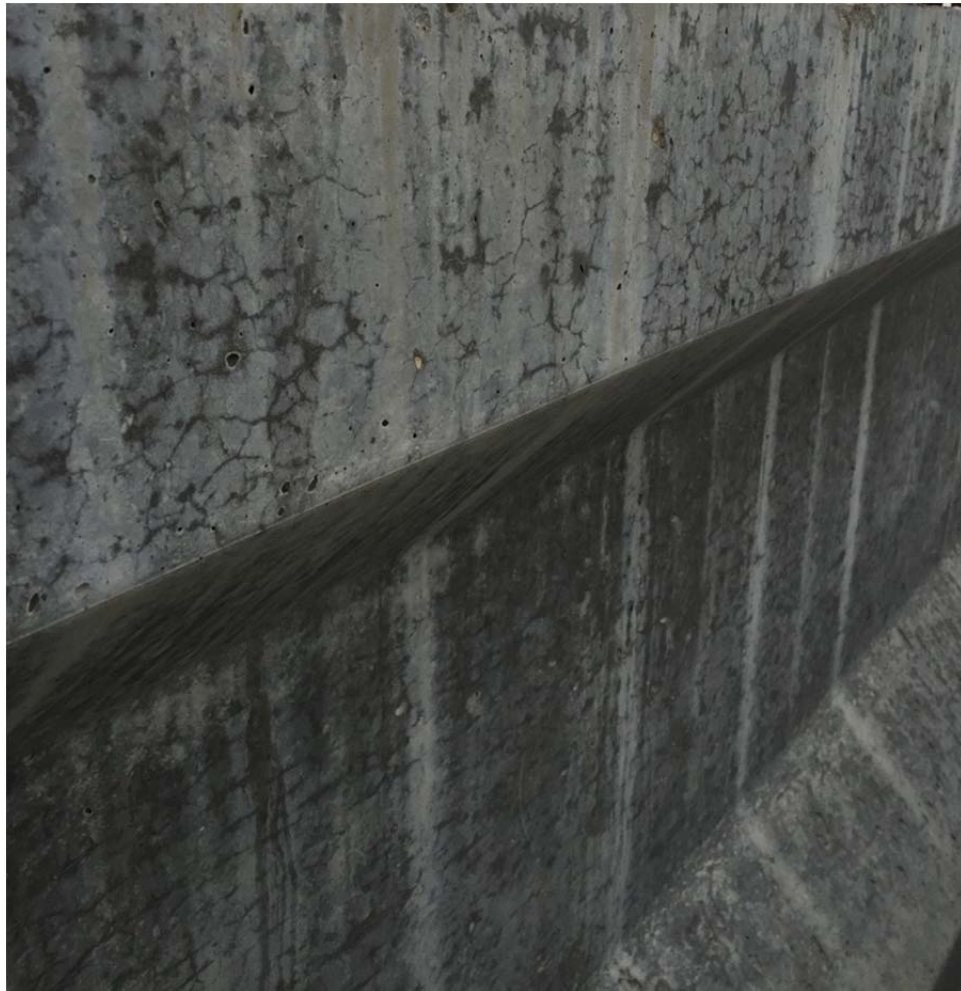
Micro-cracking focused on the top flange of a precast girder at a Waco Plant
